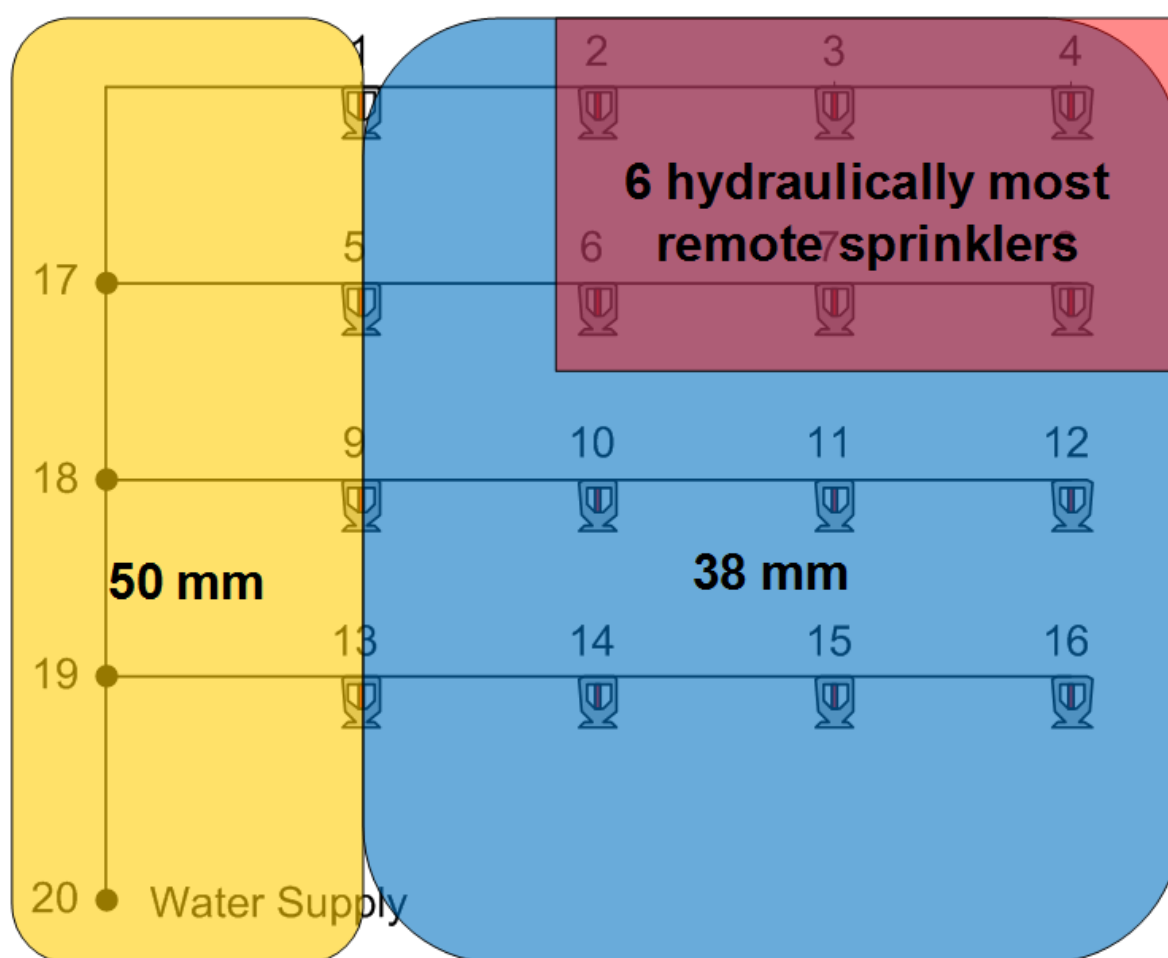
ELH hydraulic design. The 6 hydraulically most remote sprinklers are shown.
